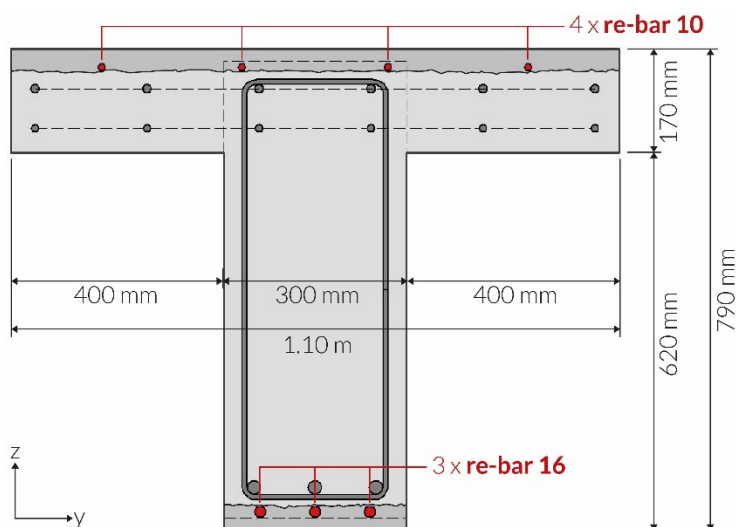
new cross-section of T-beams with re-bar flexural strengthening
